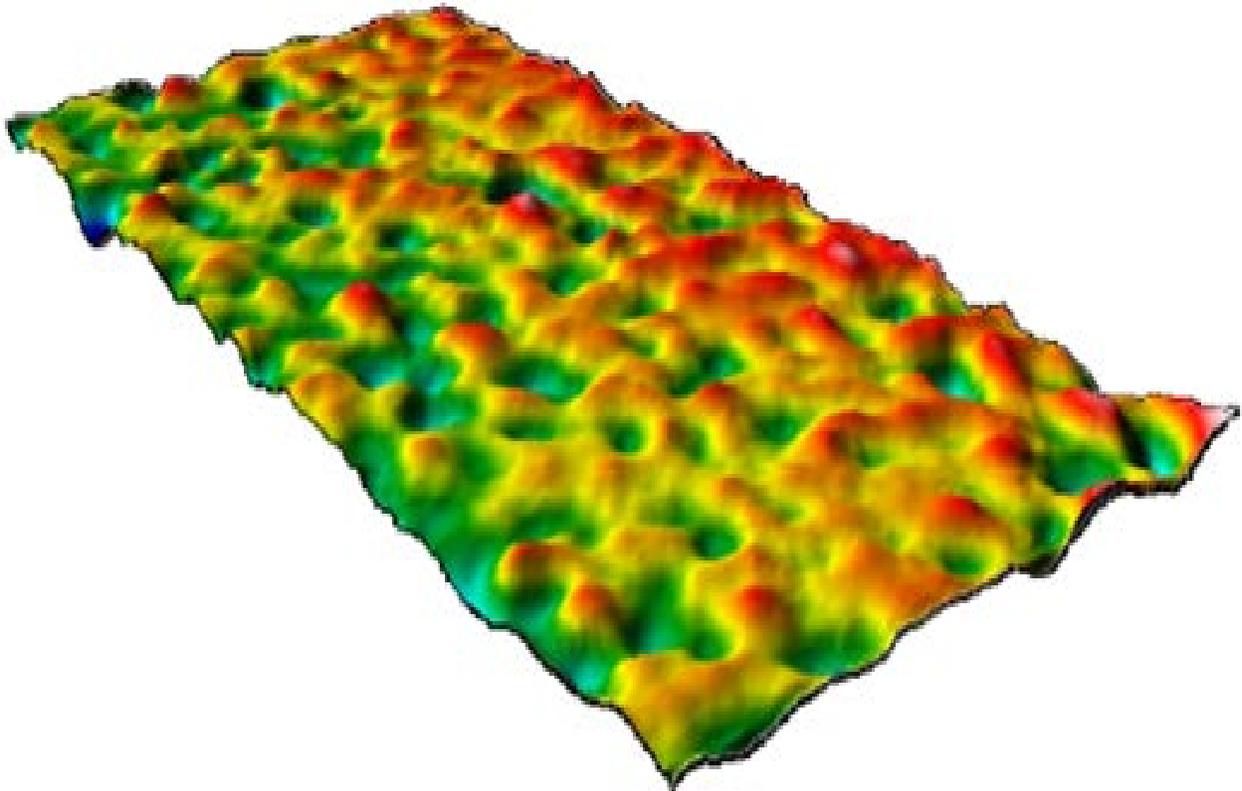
Laser Image of DOS-Treated Concrete Pavement Surface (Riemer et al. 2010)
